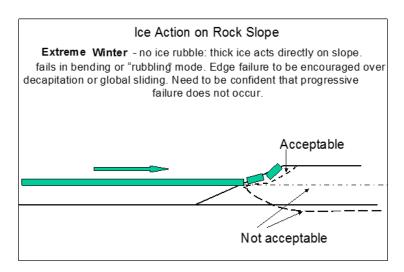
General potential failure modes of a rock berm (Croasdale, 2003)
